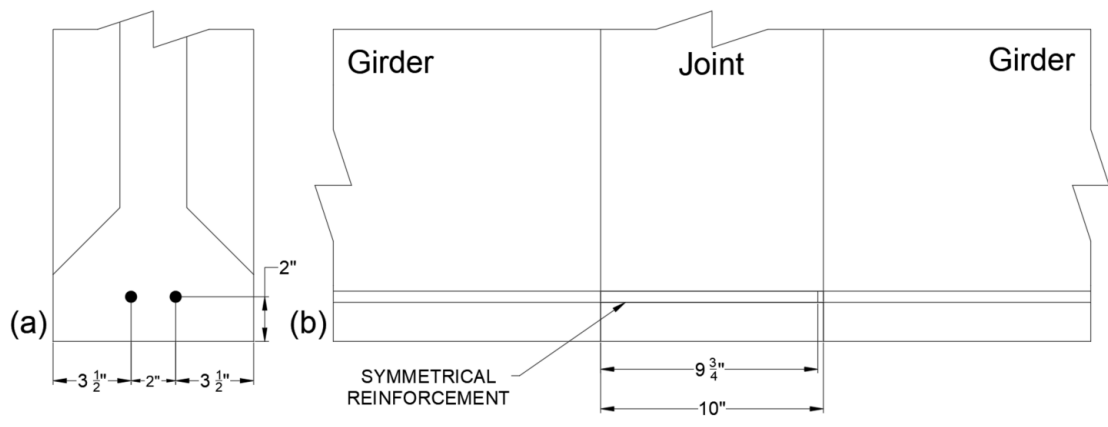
Positive moment straight strand cross-section (a) and elevation (b) view
